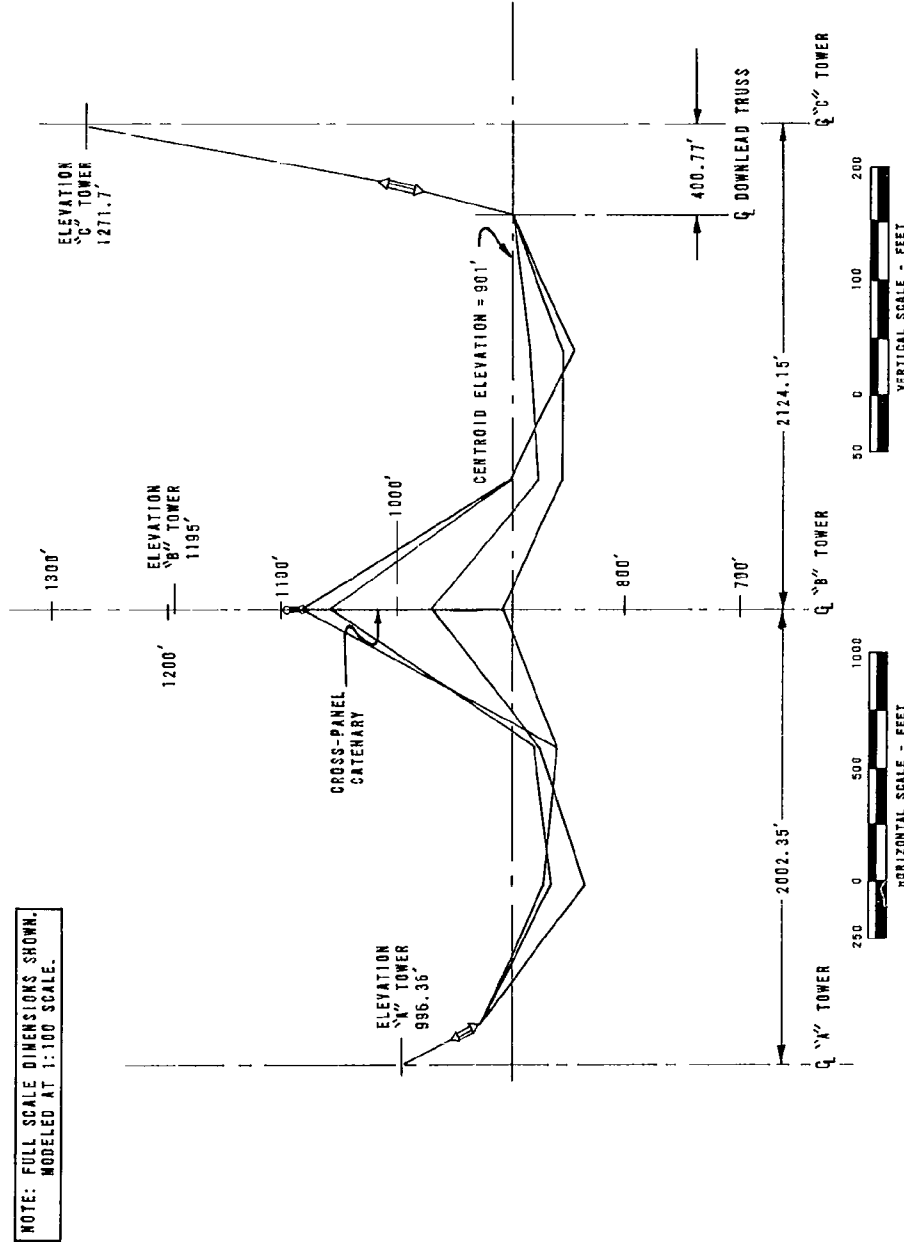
ELEVATION VIEW OF LONGITUDINAL PANEL CROSS SECTION
